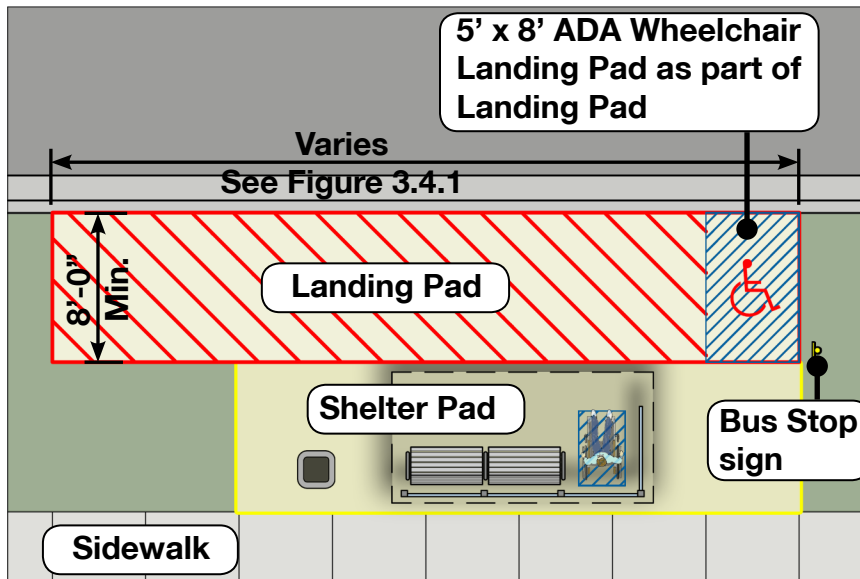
Sidewalk behind landing pad W/ separate accessory pad.
